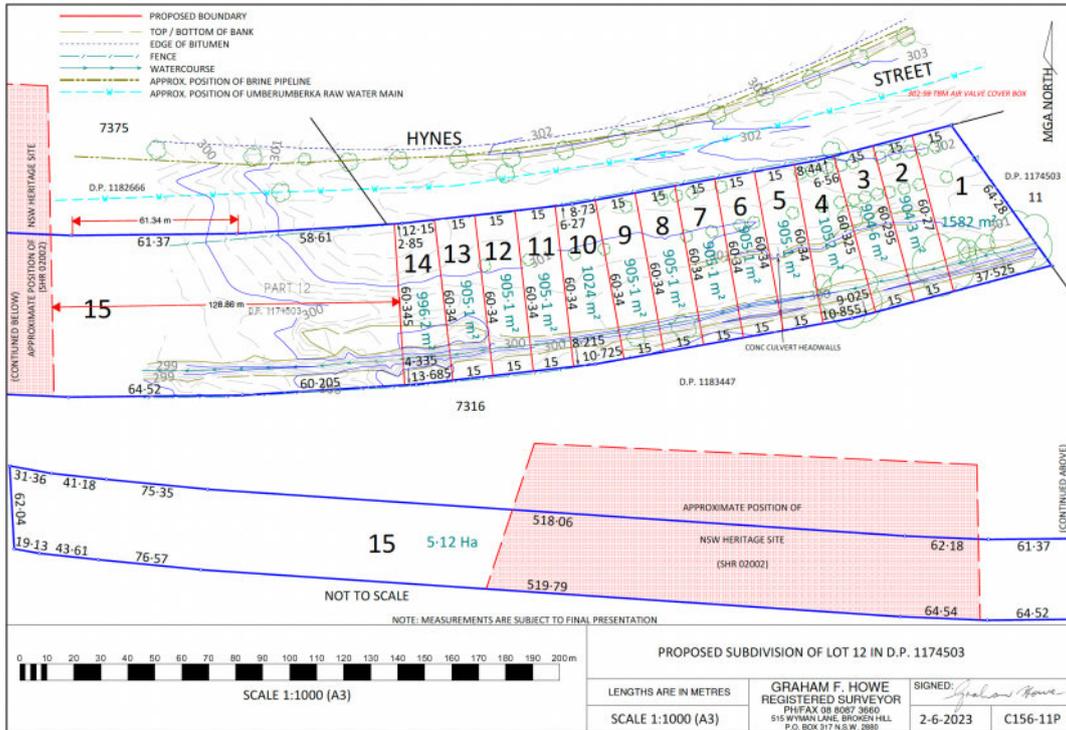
Site survey plan and proposed plan of subdivision¹⁴
